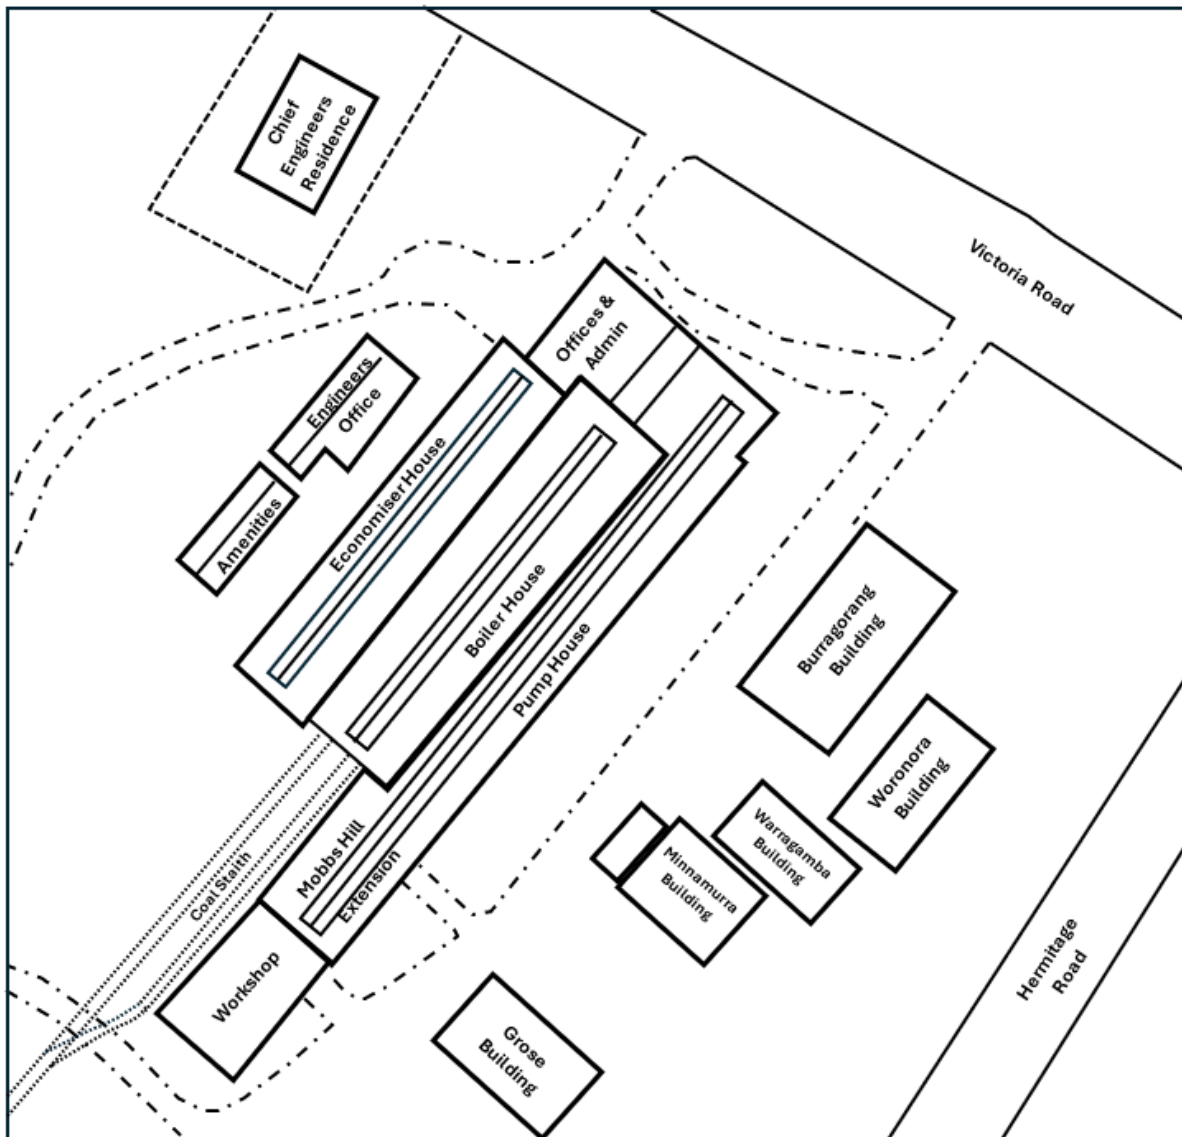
Detail Plan of No. 2 Pumping Station and surrounding buildings. (Source: SWC plans)
